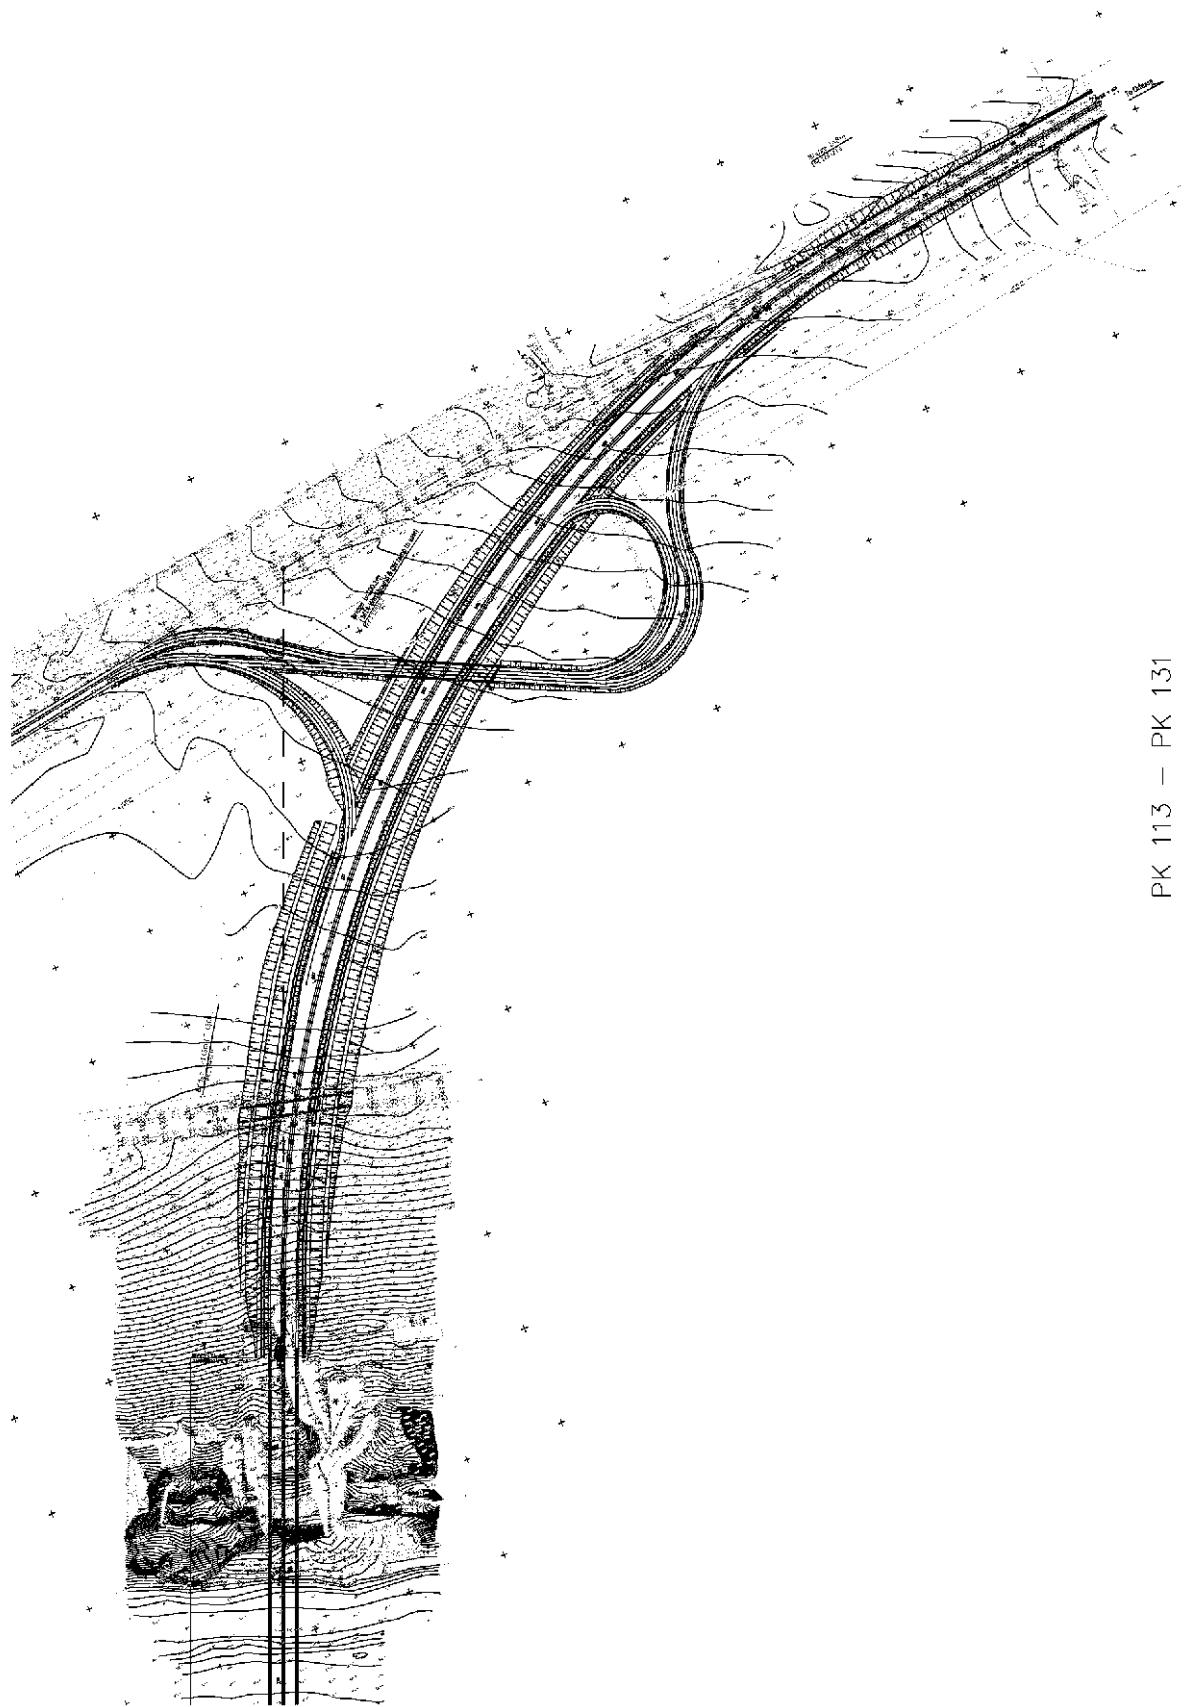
Plan of M-14 Bypass Road (4)
